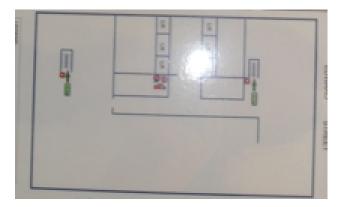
Building Seven Brisbane Typical Floor Plan serving as part of signpost in Lift Lobby
